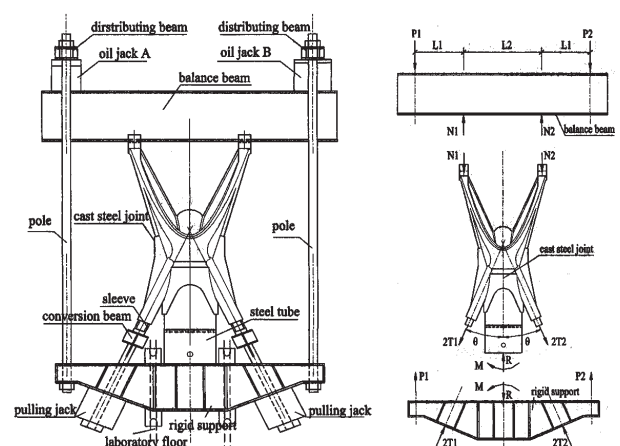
Test setup for cast steel joint of the south railroad station of Shanghai.
